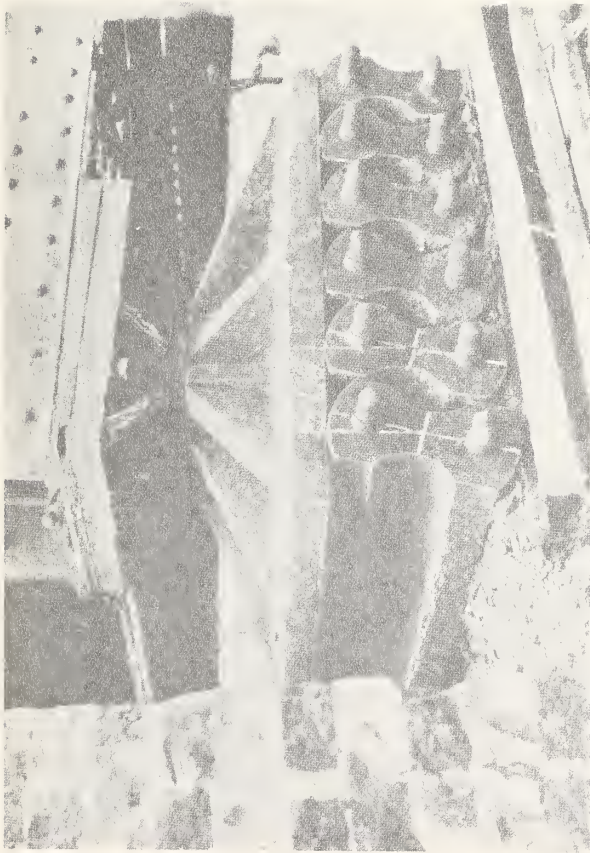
Damage to the east support at the southern abutment of the Shinminato bridge.
